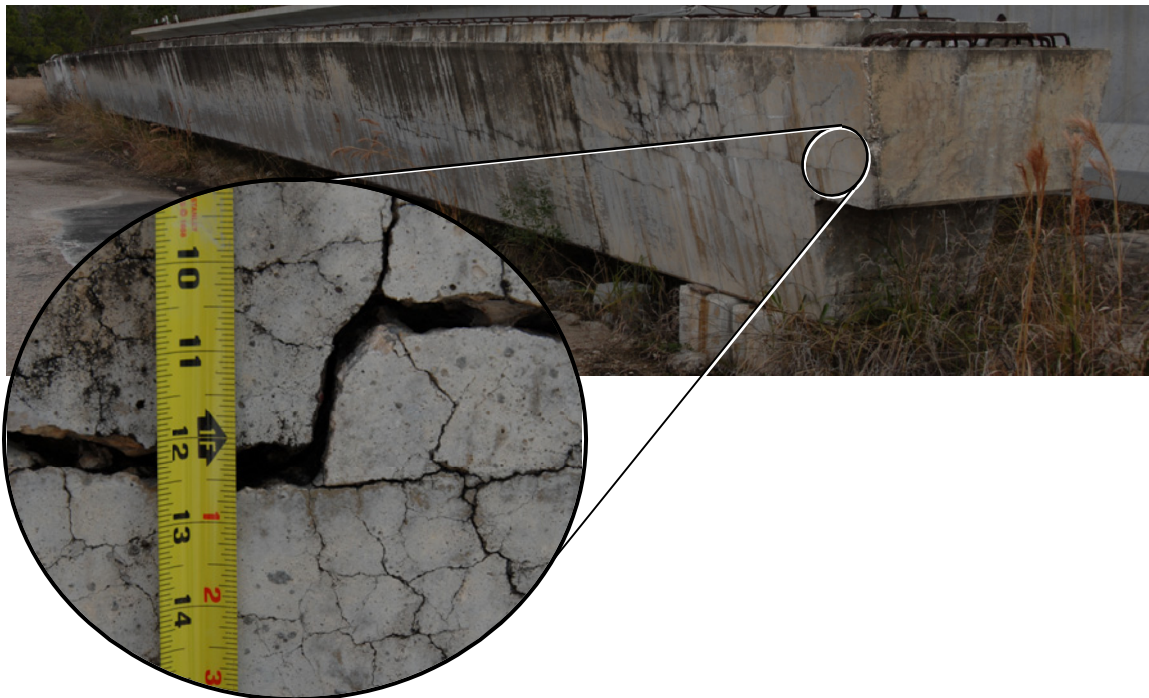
DEF damage in end block of dapped trapezoidal box beam (after 13 years exposure)
